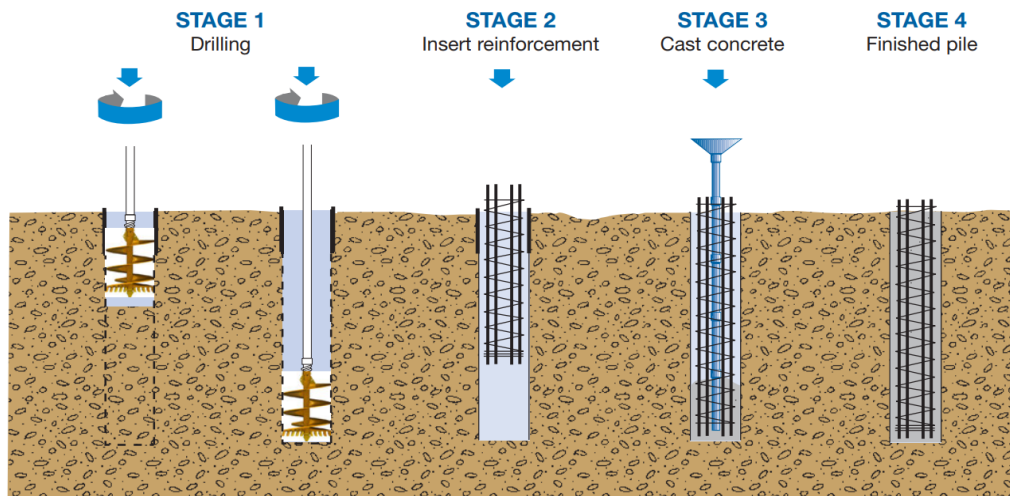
1 Pile installation sequence (Soilmec, n.d)
